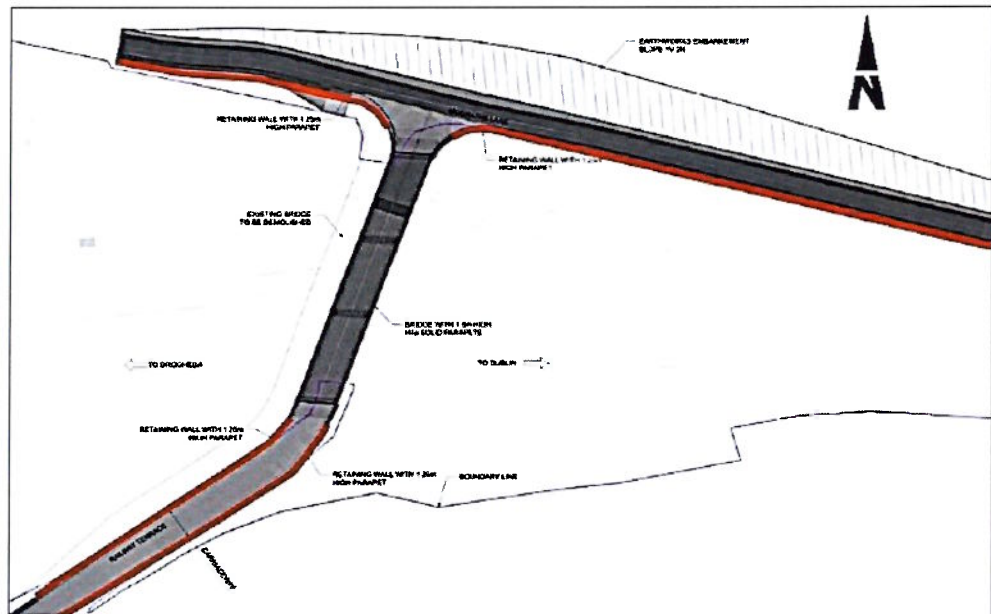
Overbridge OBB80 Extents of retaining walls (red lines)
